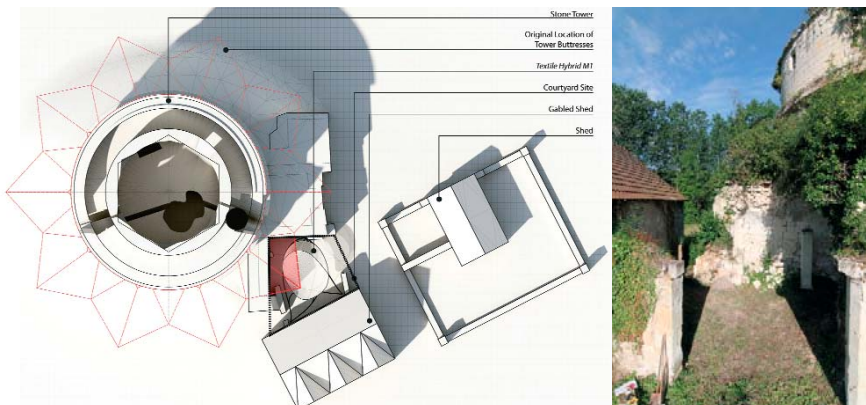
a-b: Site plan, Courtyard next to ruined tower
